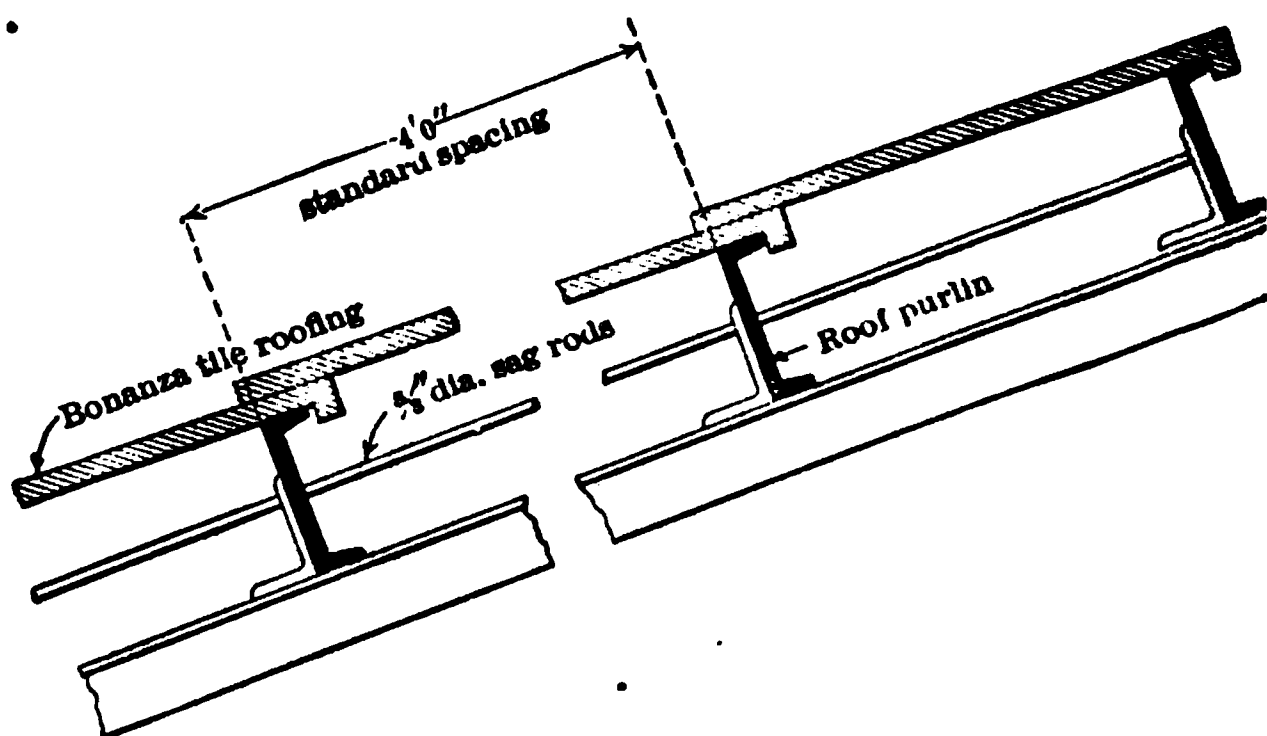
Bonanza Reinforced-cement Tiles for Pitched Roofs
